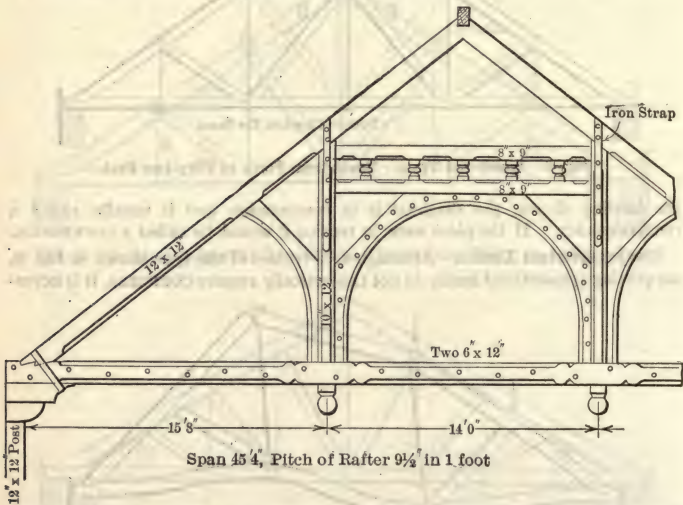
Queen-post Truss. Massachusetts Charitable Mechanics' Association Building, Boston, Mass.
